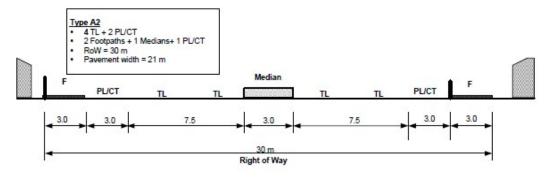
Typical cross section of Arterial (Feeder Roads)
